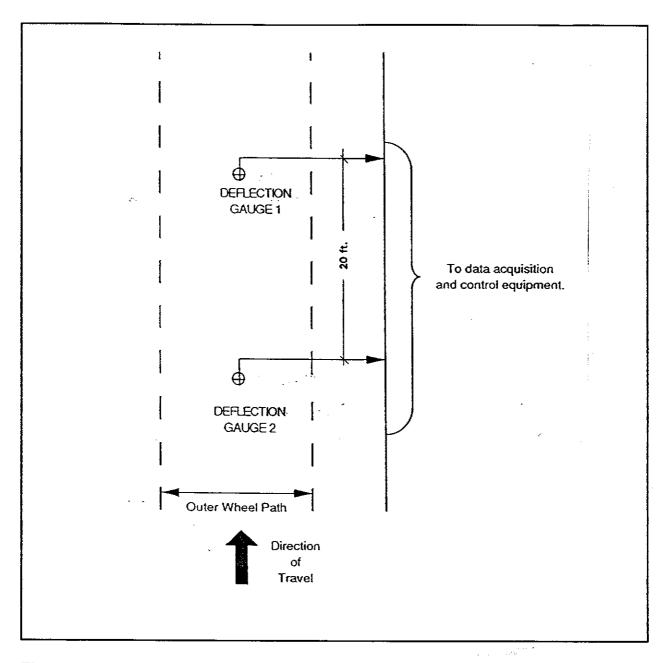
Instrumentation layout for the instrumented pavement section.
